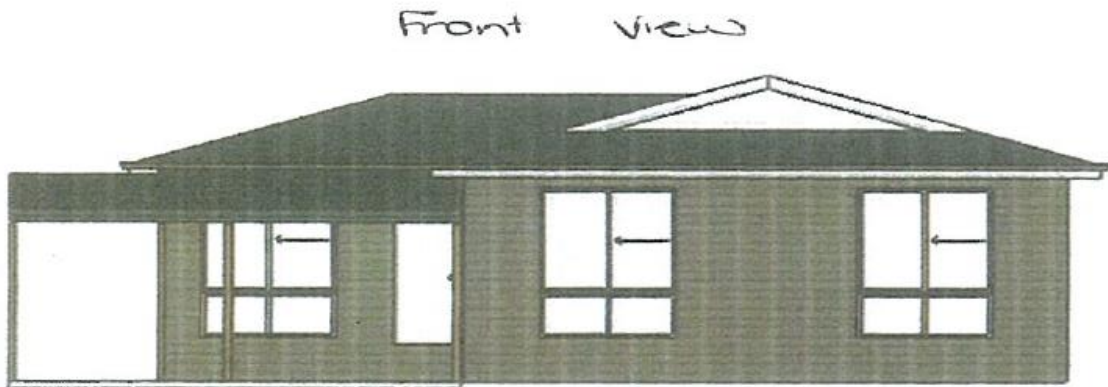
Artist impression of the proposed carport, front view from Berrigan Street
